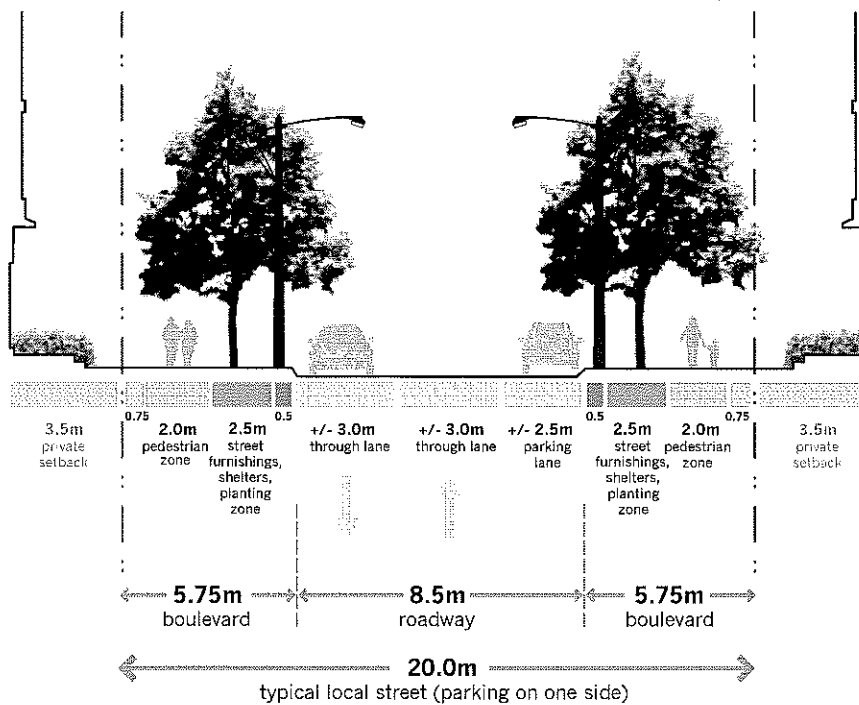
FIGURE J > LOCAL STREET B (20 METRE RIGHT-OF-WAY)
